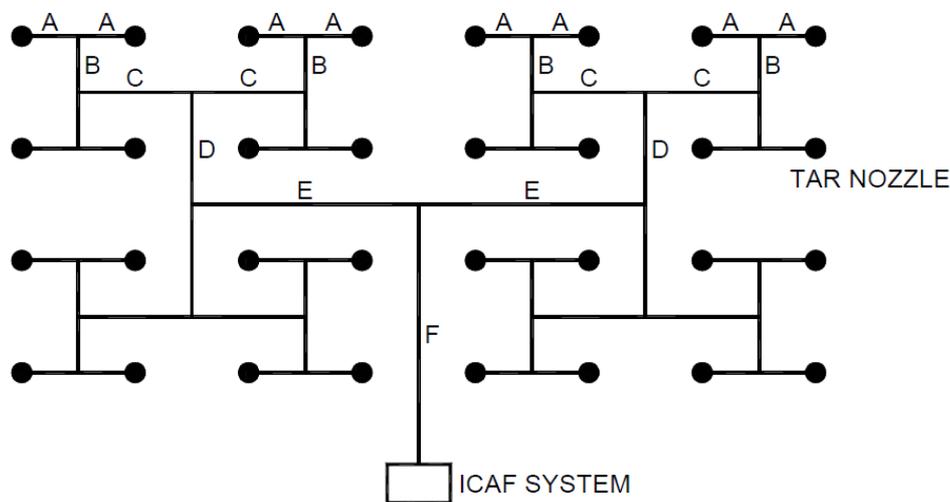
An example of a balanced piping layout for larger CAFS [46]. This layout is required to ensure that each nozzle in the design discharge the same amount of CAF.
